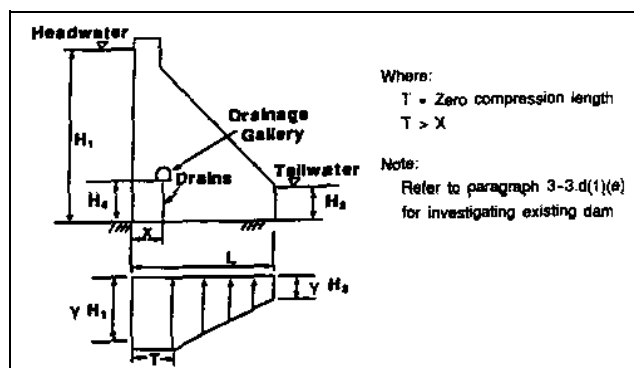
Uplift distribution cracked base with drainage, zero compression zone extending beyond drains
